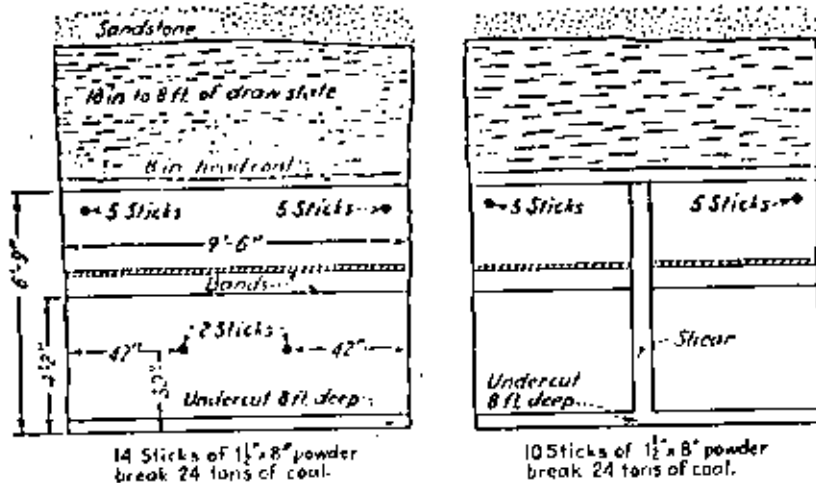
Drilling plans for 2 1/2 ft. headings. Room plans are identical. About 20% more powder is used in places shown on the left. (Coal Age.)
